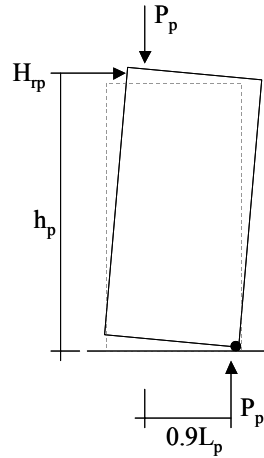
External forces on a rocking pier (Adopted from Abrams 2000)
